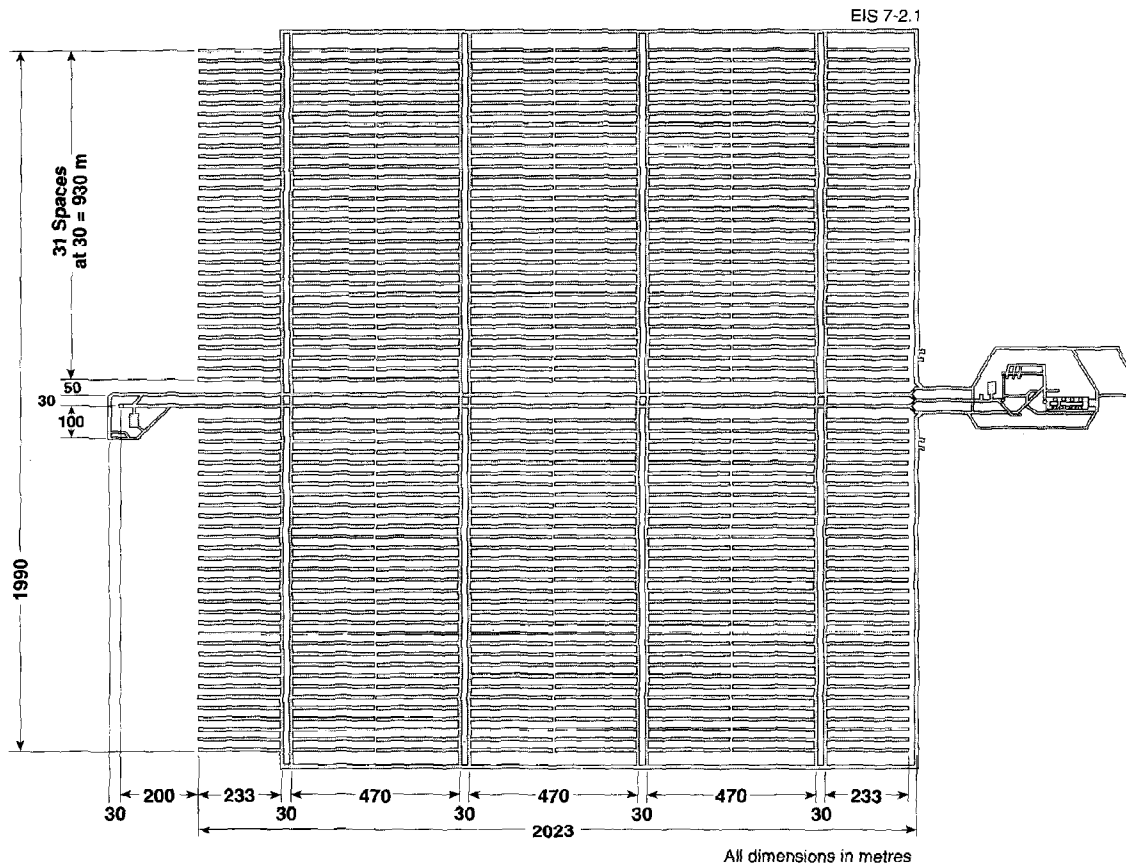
General Plan Layout of the Disposal Vault (Simmons and Baumgartner 1994)
